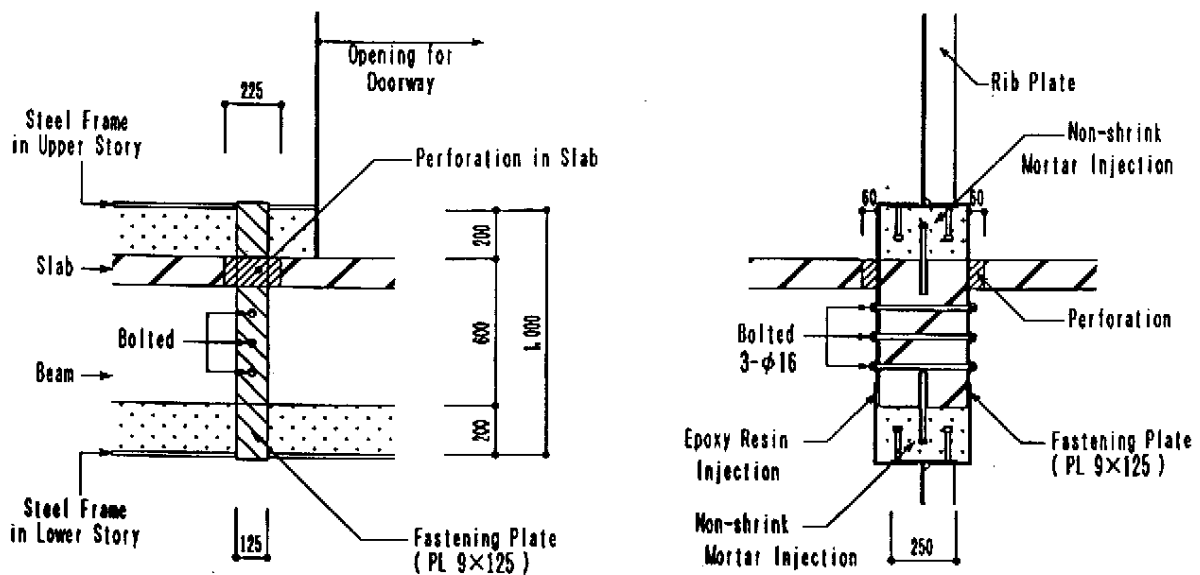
Three storied RC school building retrofitted with steel panel having discontinuous frame
